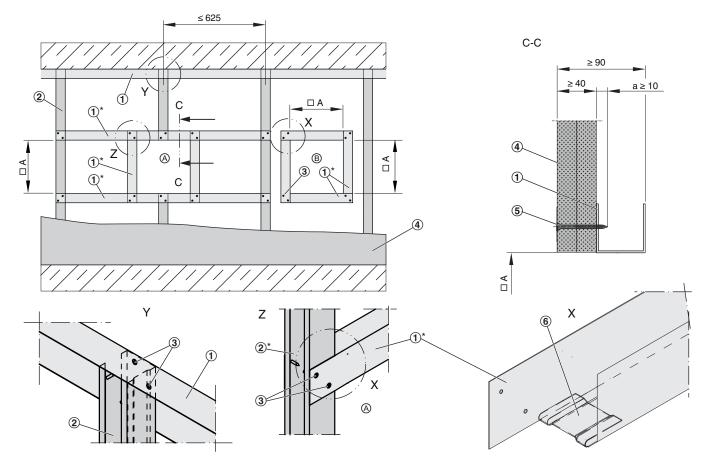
Lightweight partition wall with metal support structure and cladding on one side
